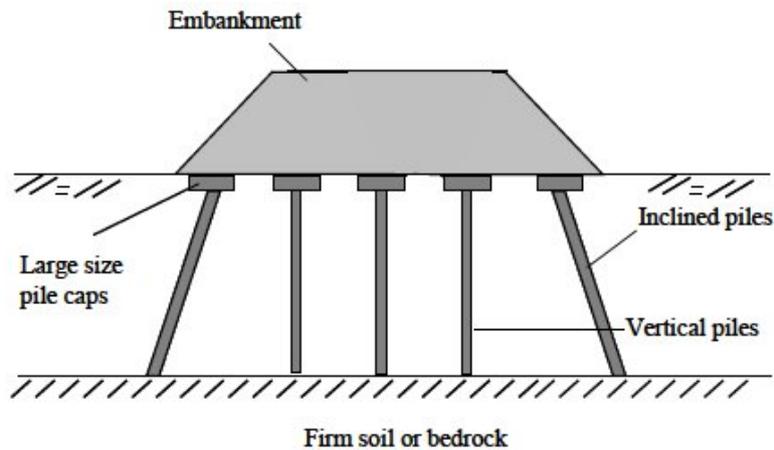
Piled embankment with batter piles, indicated as 'inclined piles' (Sakleshpur & Madhav, 2013).
